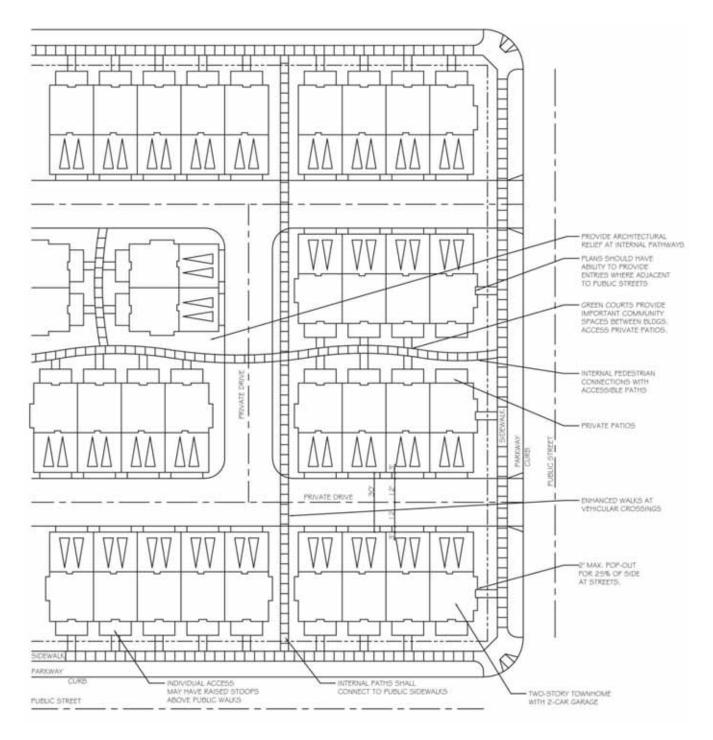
Typical Multi-Family Plotting "Two-Story Townhome"
